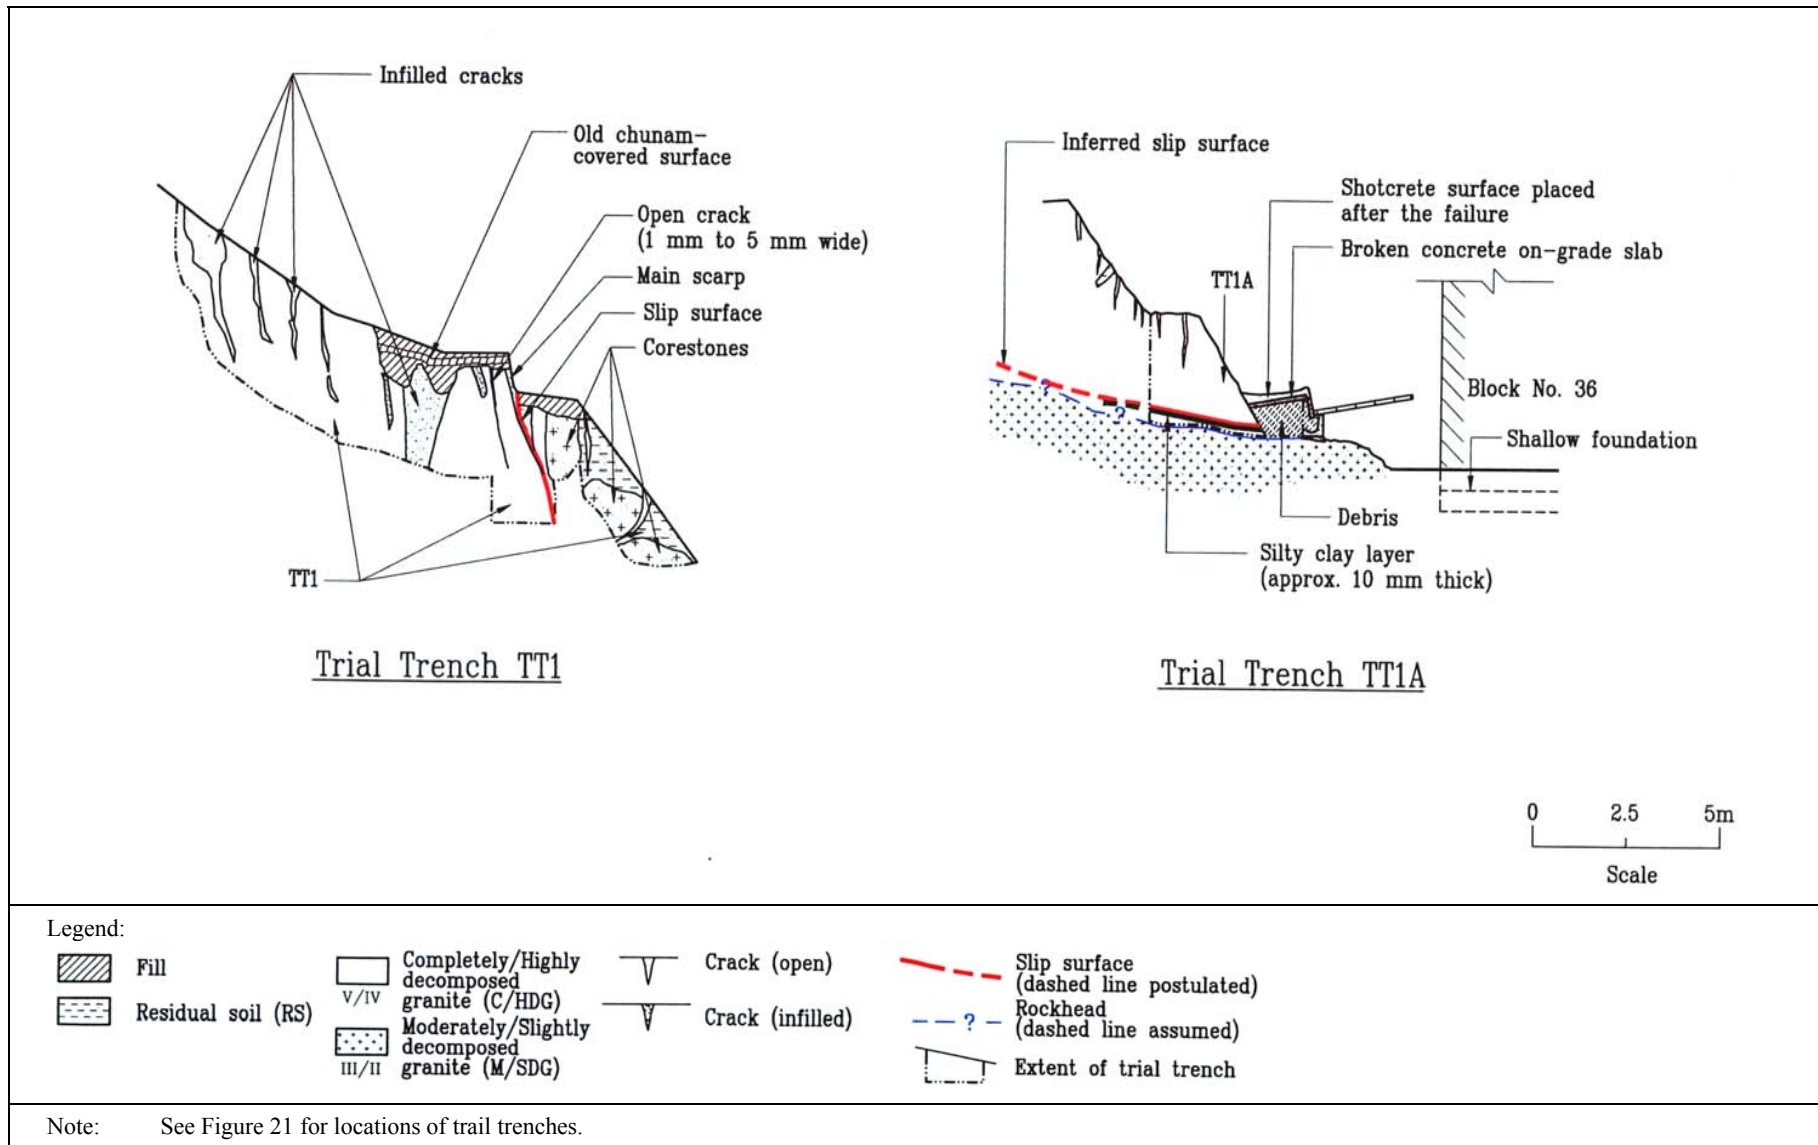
Main Observations in Trial Trenches at Section 1-1
